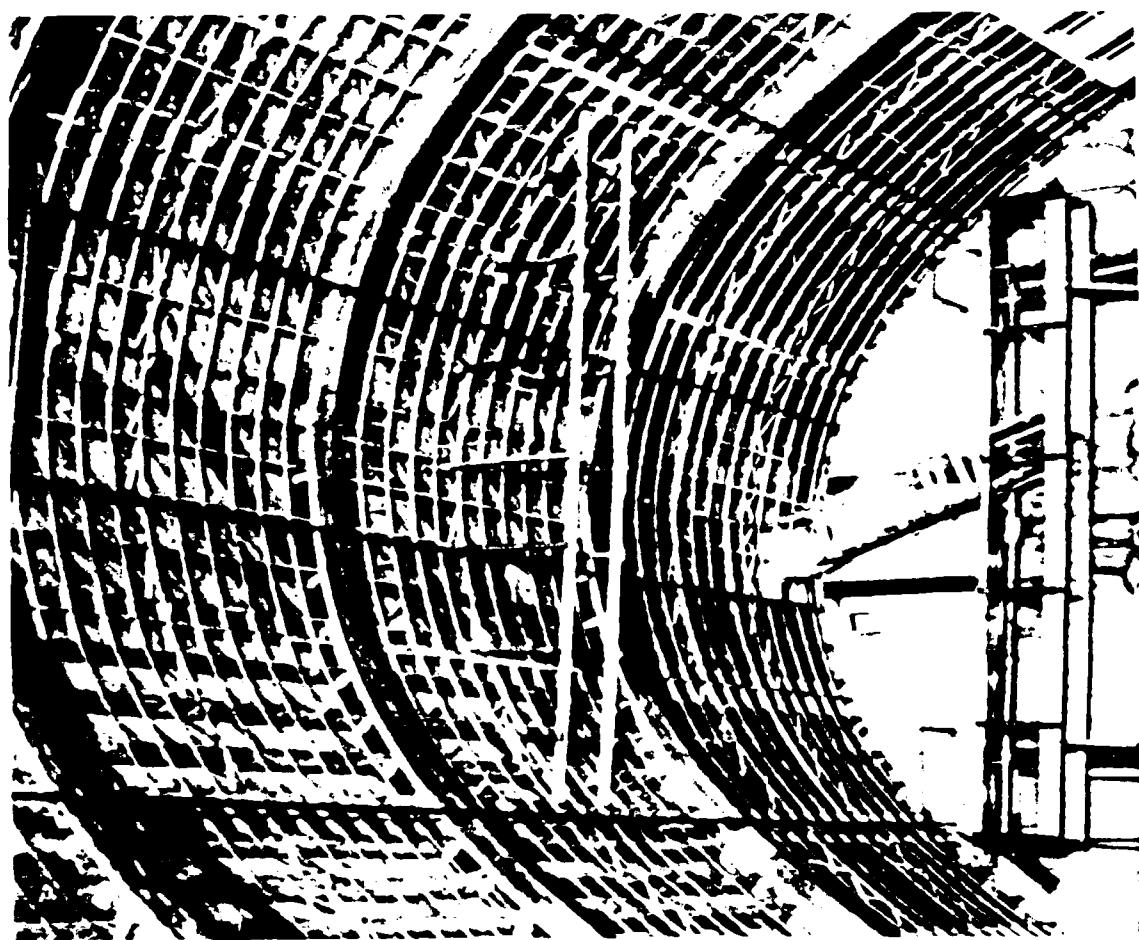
Interior radar test facility (Building 140), Lexington Facility. The laminated wood paraboloid arch and timber frame are visible inside the building. (Source: Field inventory photograph, 1983, William A. Bremer, Building Technology, Inc.)
